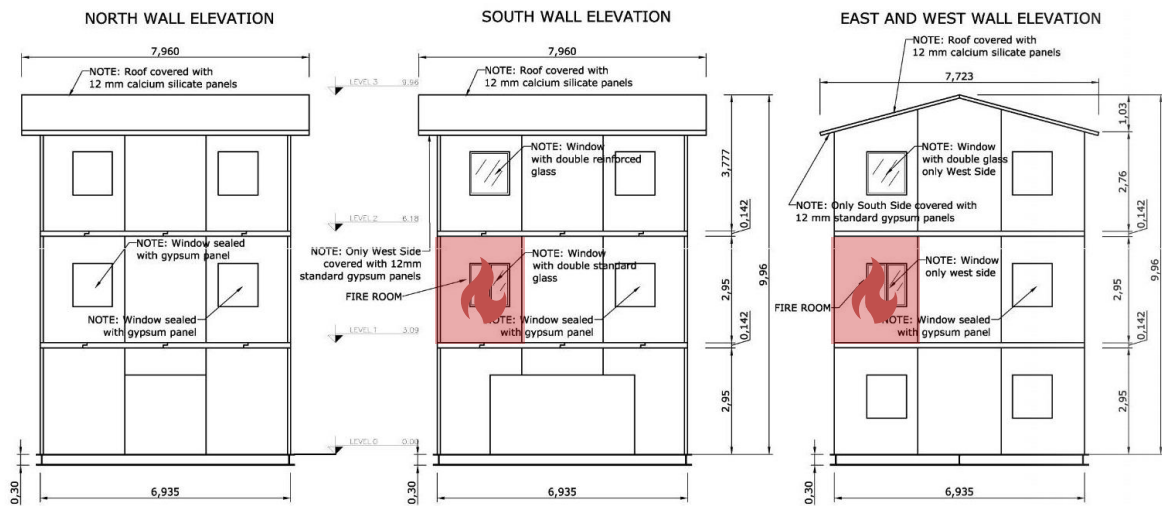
Elevations of 3-storey timber building for the natural full-scale fire test [42]
